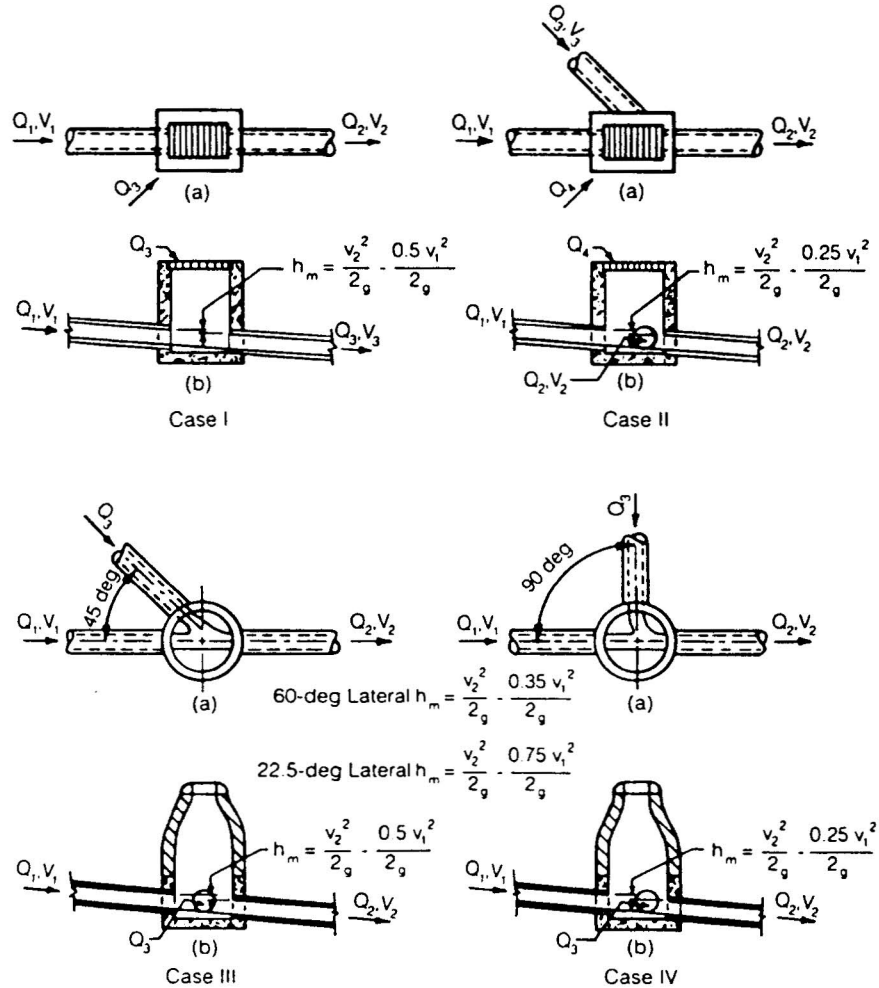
Minor head losses due to turbulence at structures: case I—inlet on main line (a) plan and (b) section, case II—inlet on main line with branch lateral (a) plan and (b) section, case III—manhole on main line with 45-deg branch lateral (a) plan and (b) section, and case IV—manhole on main line with 90-deg branch lateral (a) plan and (b) section (City of Austin, 1987).
